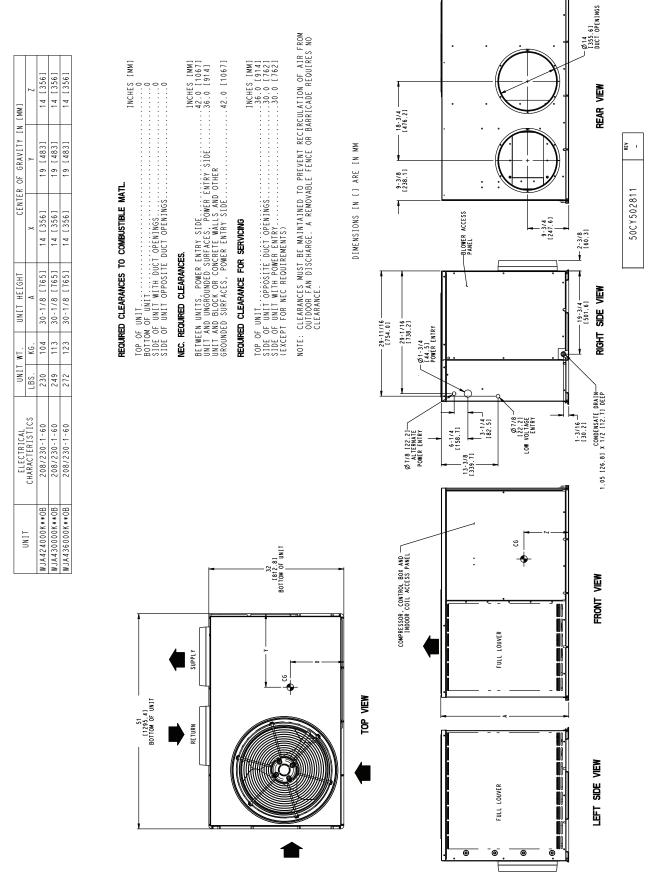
Unit Base Dimensions, WJA4 024-036
